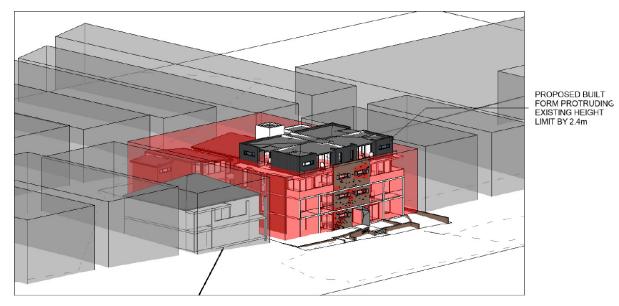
Proposed building envelope for site and surrounds Source – LAHC
